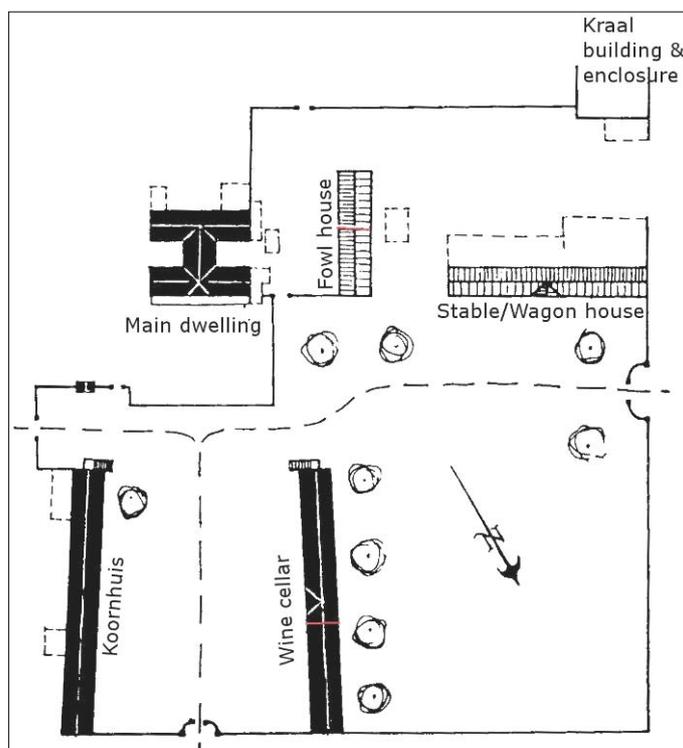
Werf layout as presented in Walton (1989:41) attributed to Hans Fransen. Red lines indicate approximate location of original end walls of buildings.
